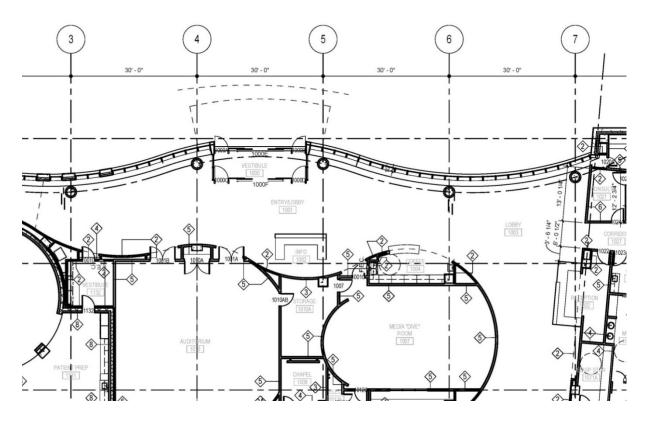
Lobby Reflected Ceiling Plan (NTS)
